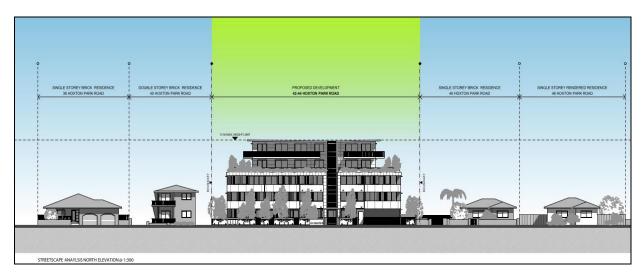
Streetscape Elevation of the approved development at 42-44 Hoxton Park Road
